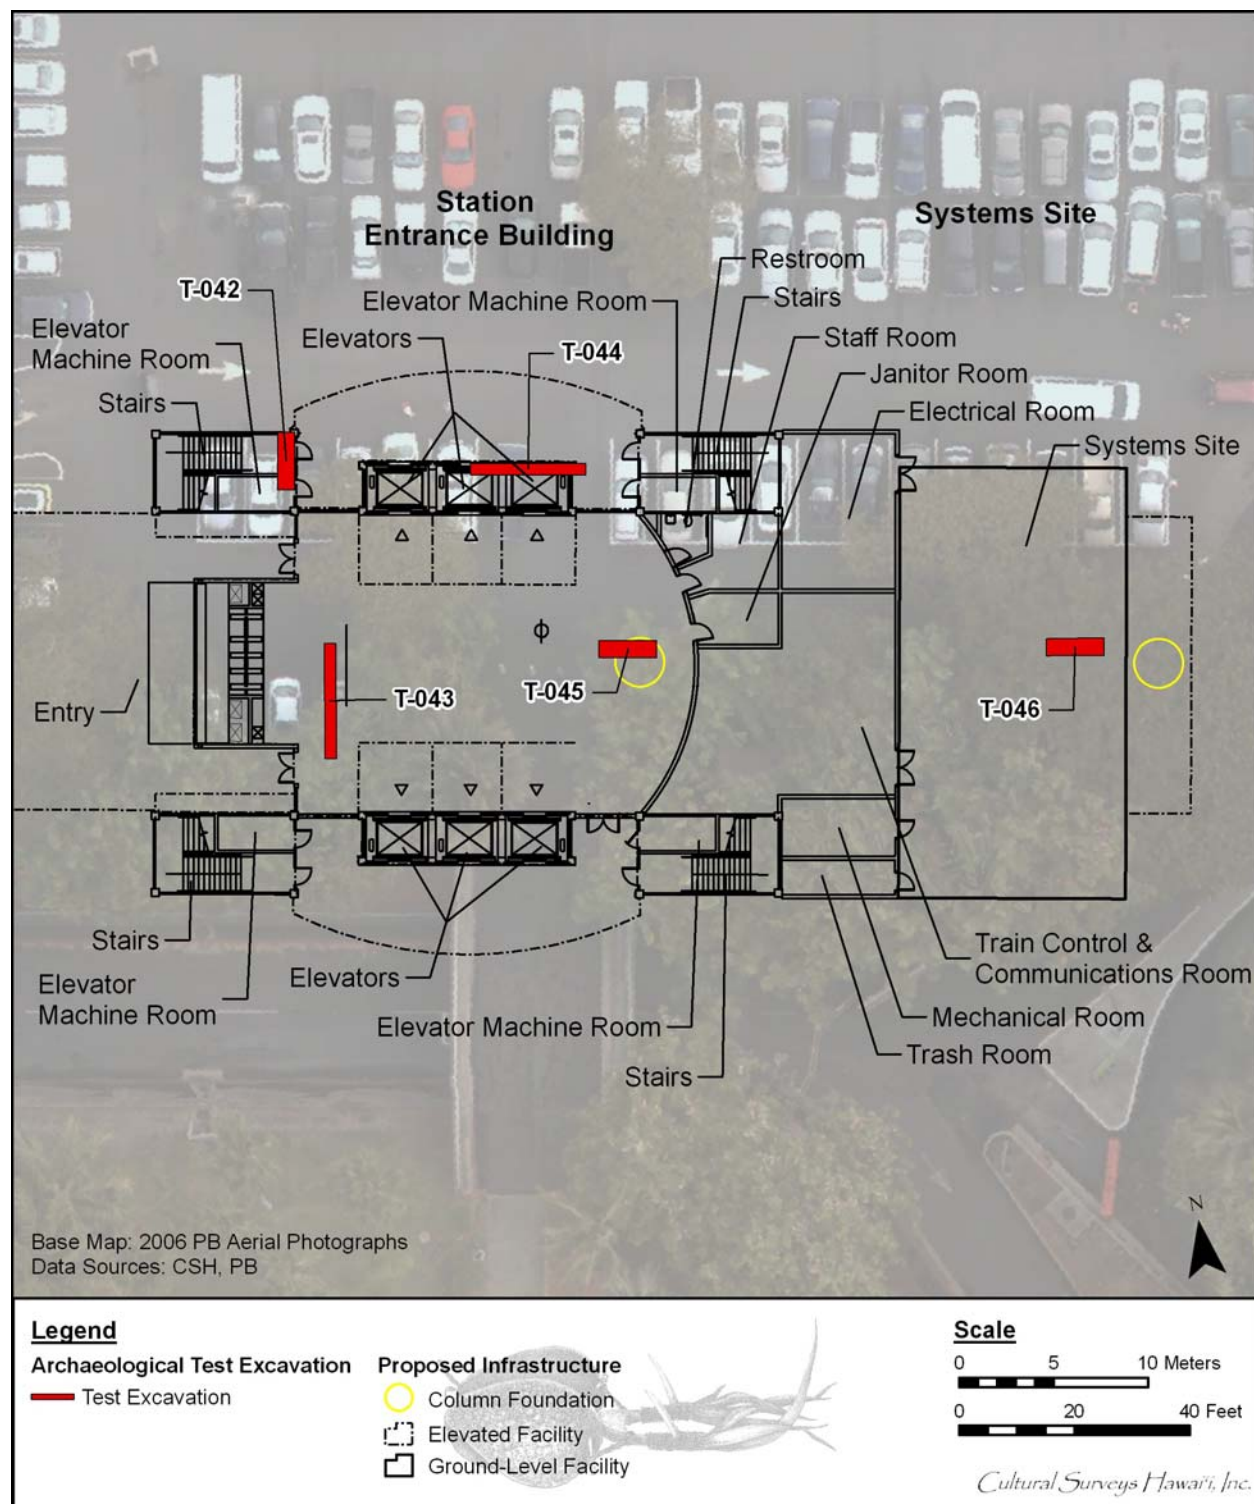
Honolulu International Airport Station overview of Test Excavations at the Alternate (southern) station footprint showing the location of T-042 to T-046
